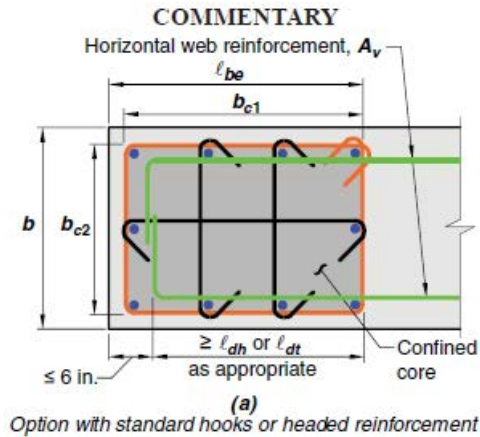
Development of wall horizontal reinforcement in confined boundary element.
